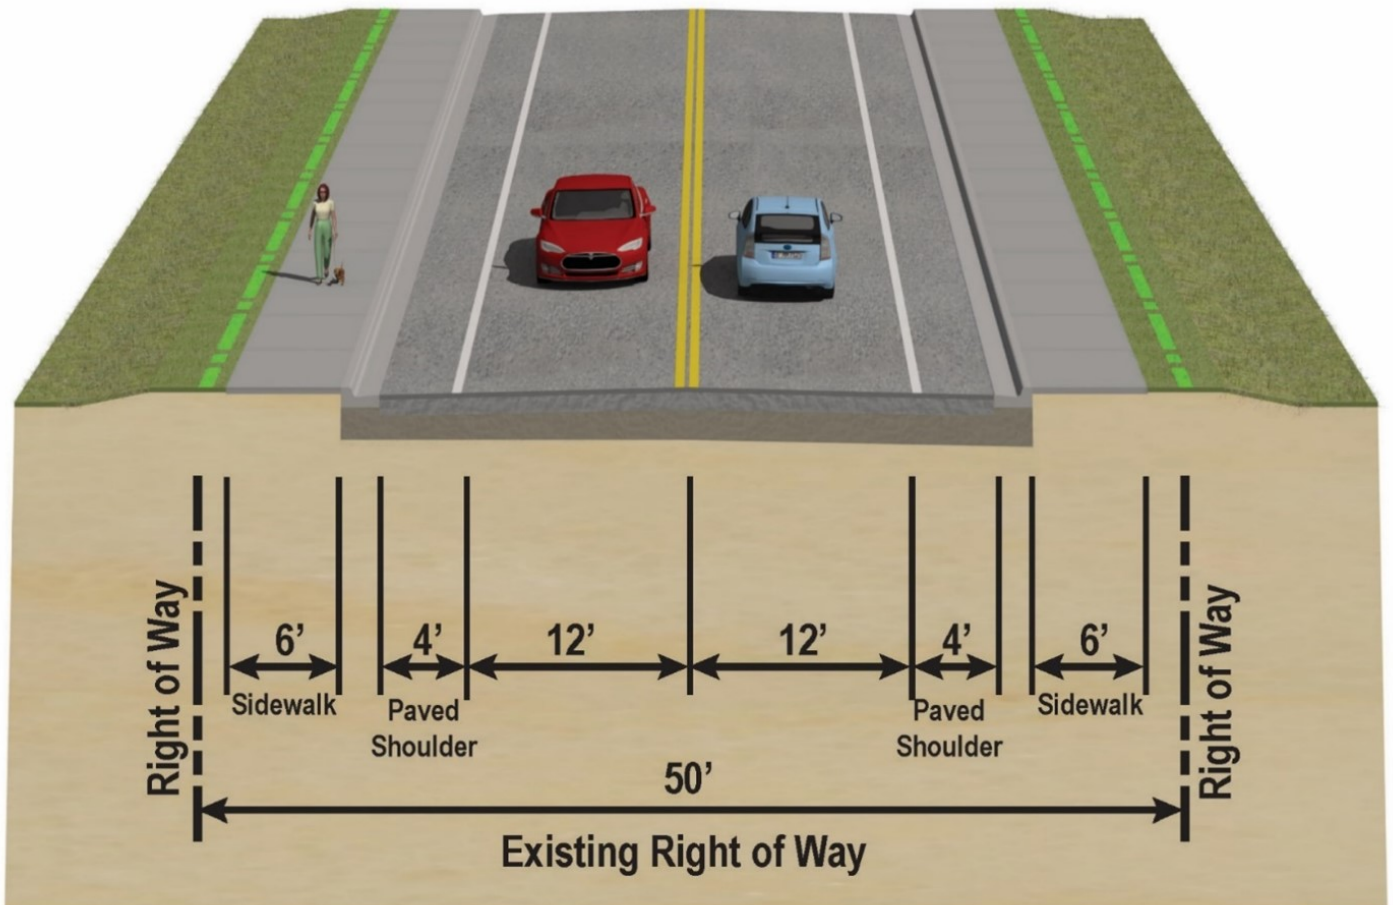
Existing Typical Section - Avenue Y to La Vista Drive
